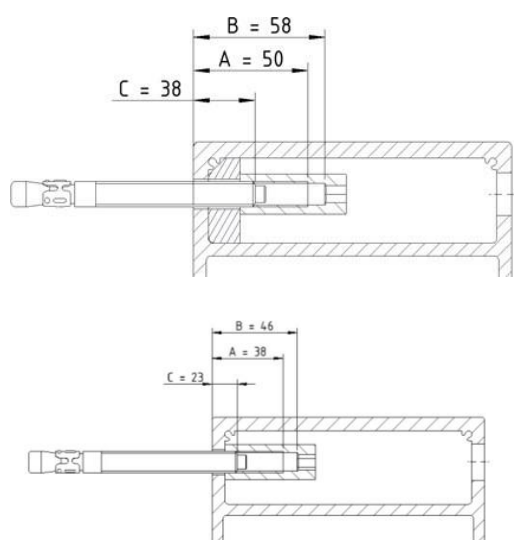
Dimensions required for wall bracket anchor with aluminium washer
